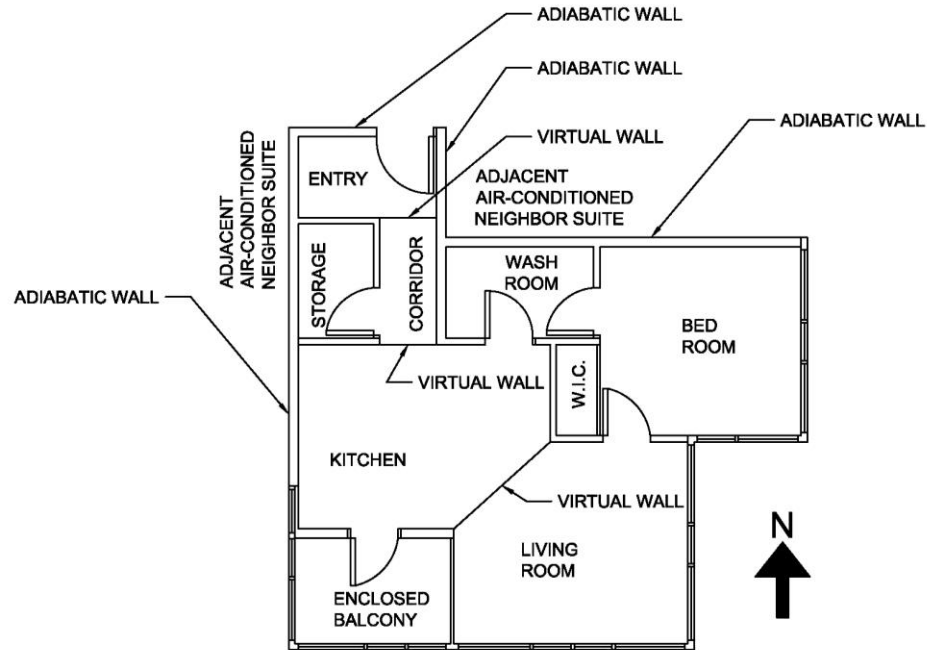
The plan of the hypothetical top-floor corner condo suite (Azimuthal orientation is 0 degrees)
